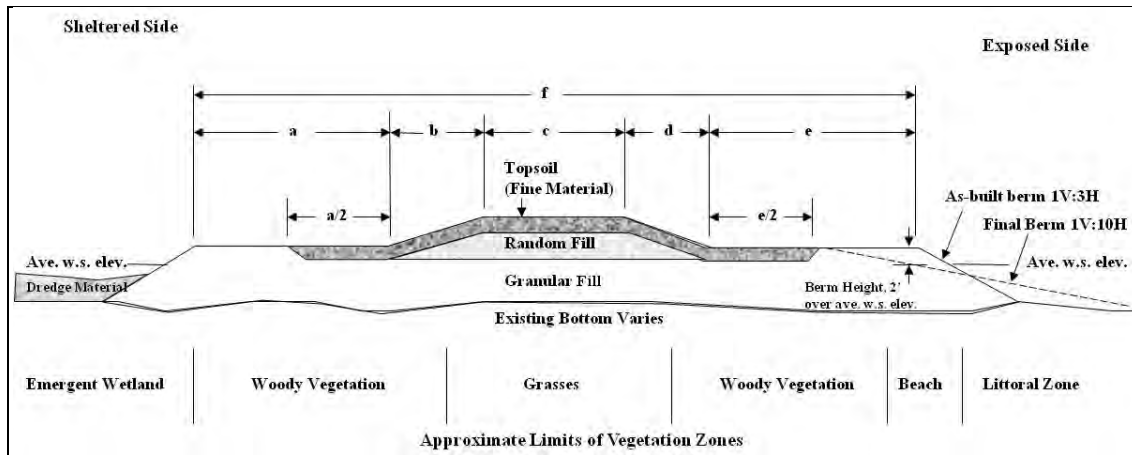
Island Cross Sections Typically Used for Island Construction
